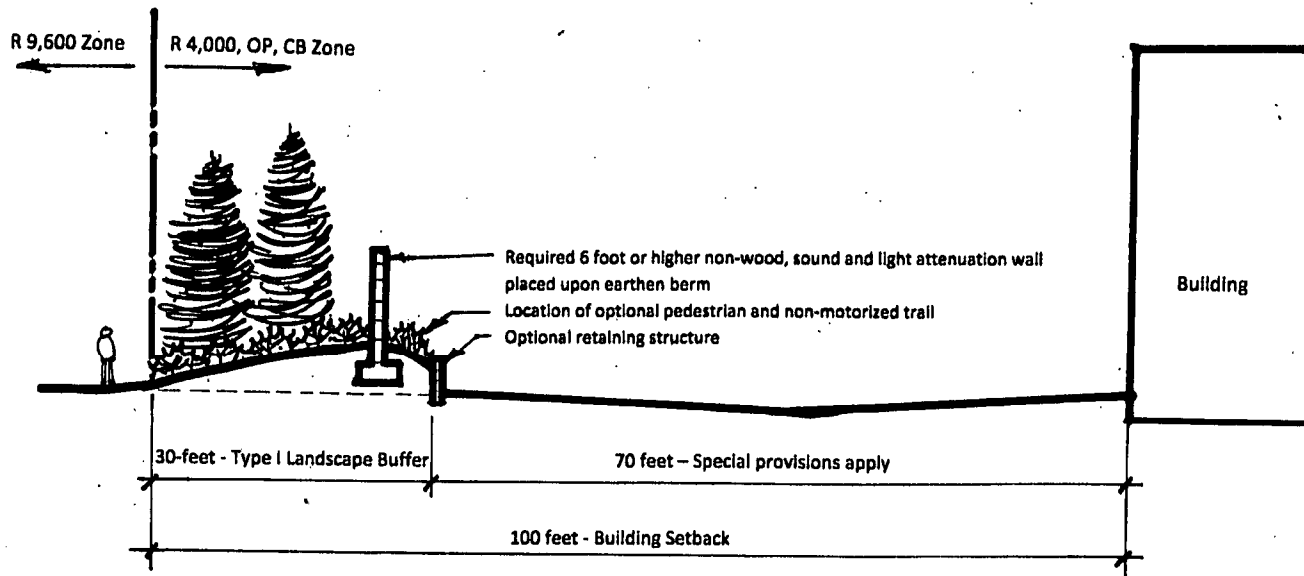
Illustrating the 30-foot landscape buffer and 100-foot building setback pursuant to 12.46.060.1
